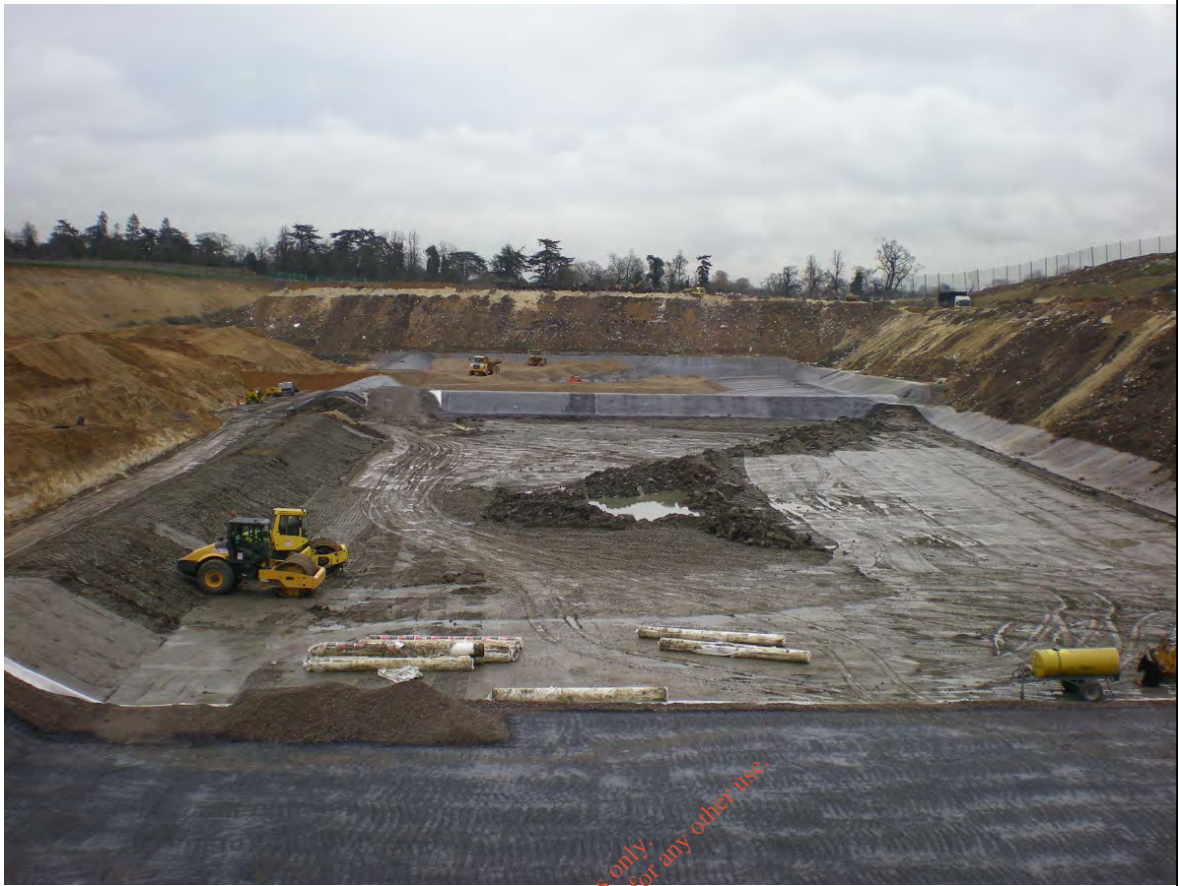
Lining of landfill cells with DAC at a UK Landfill Site
